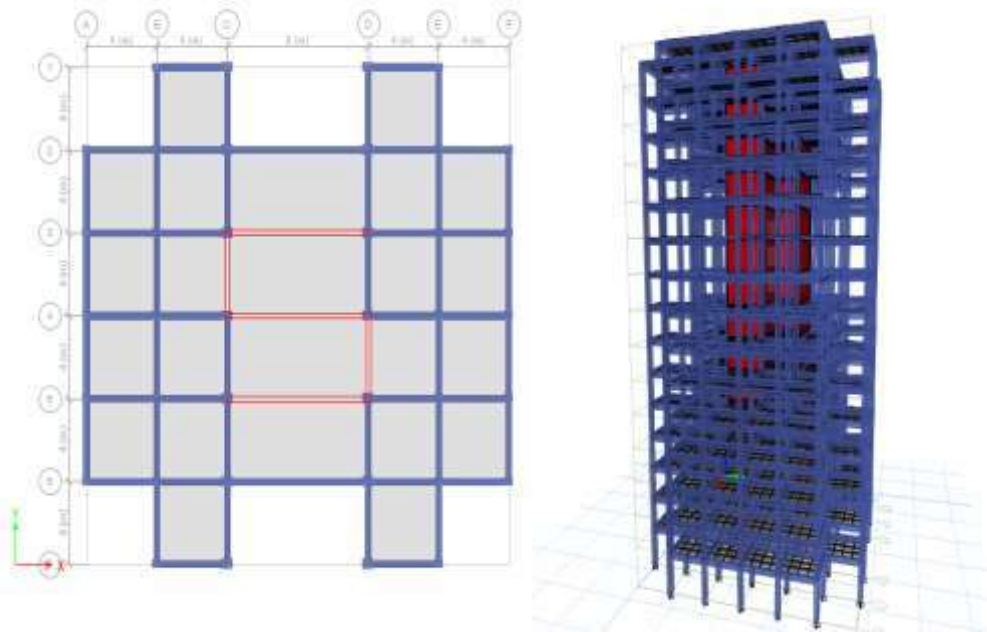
Model 5 Regular building with S Shape shear wall at center.
